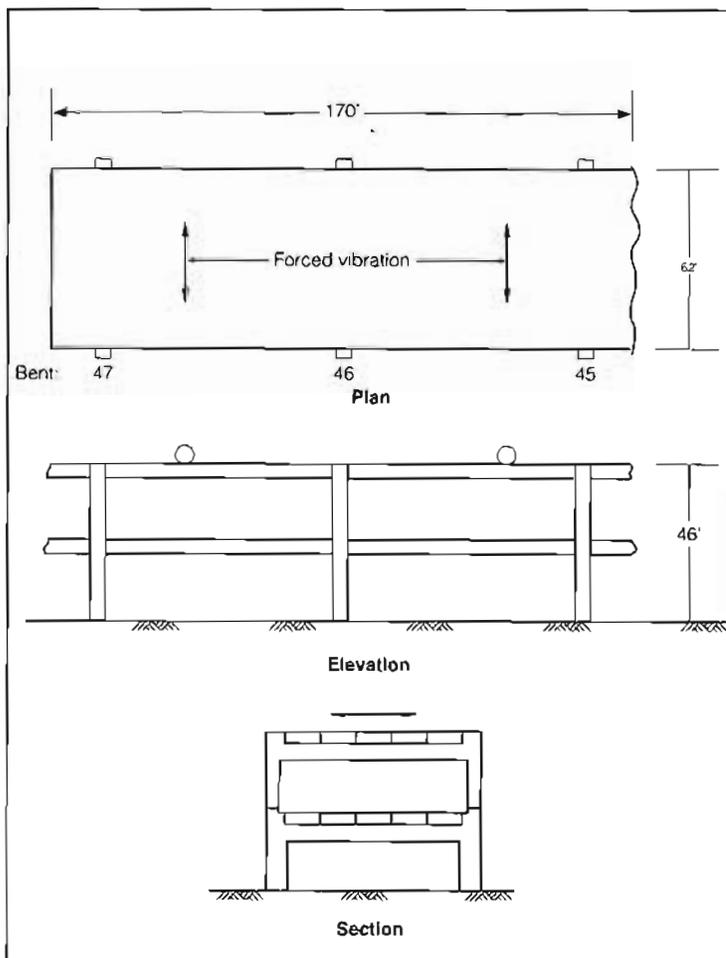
Schematic view of Cypress Viaduct test structure.
